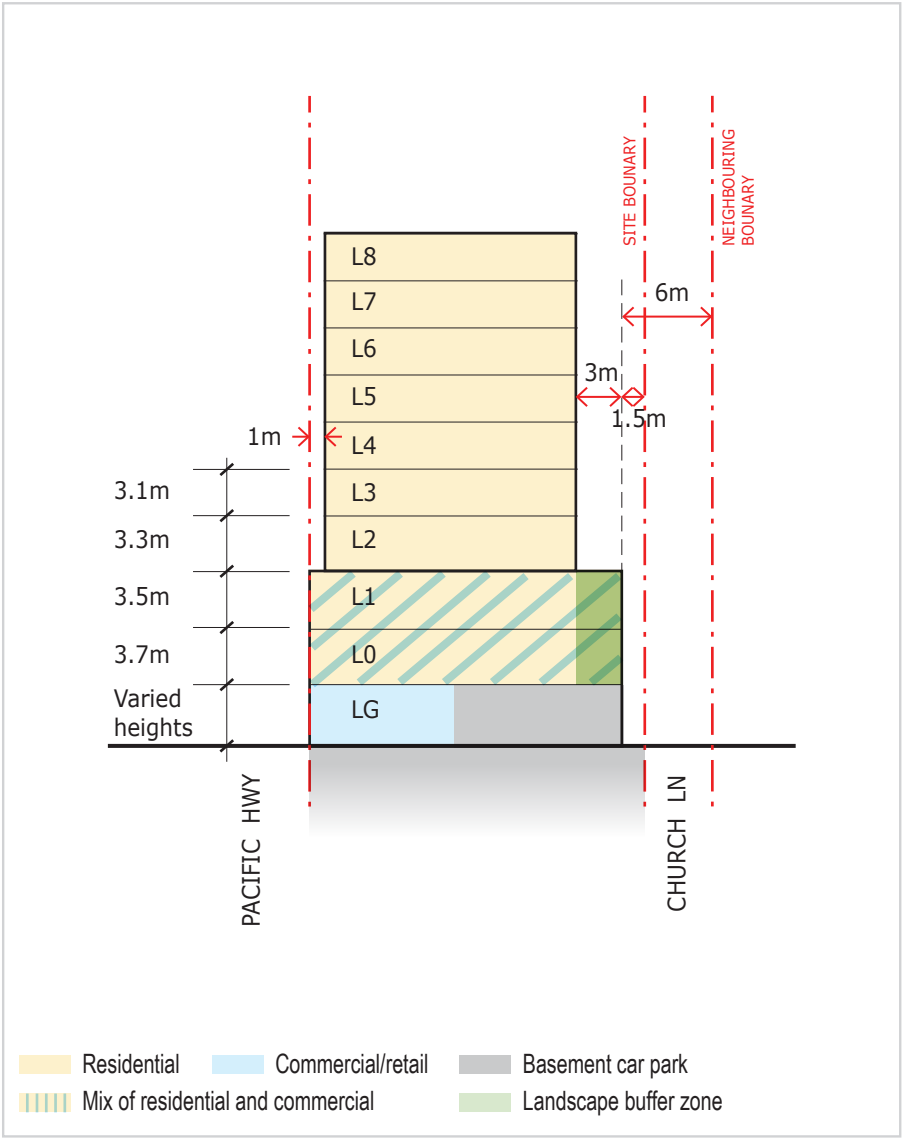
Upper level setbacks to Pacific Highway and floor to floor heights
